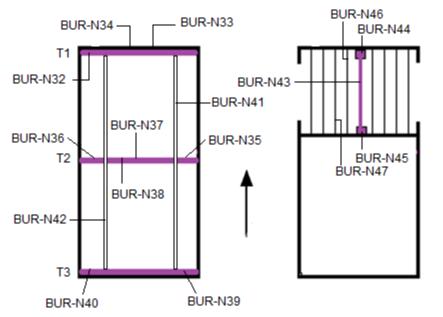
Sketch plan of the gatehouse, showing the location of sampled timbers, samples BUR-N32-BUR-N47
